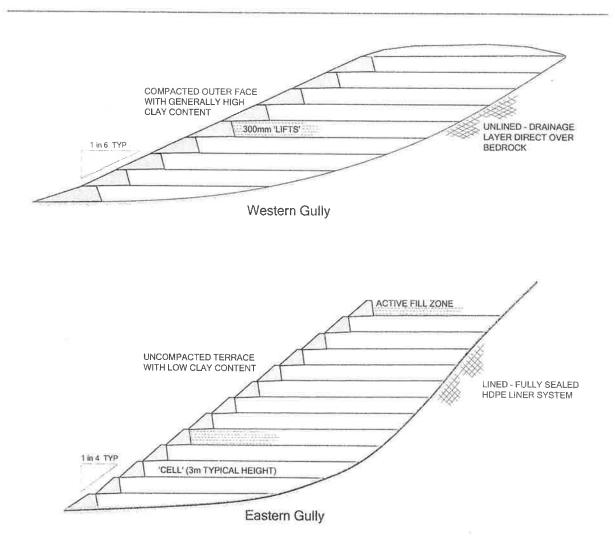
Whytes Gully Landfill Typical Sections (not to scale)
